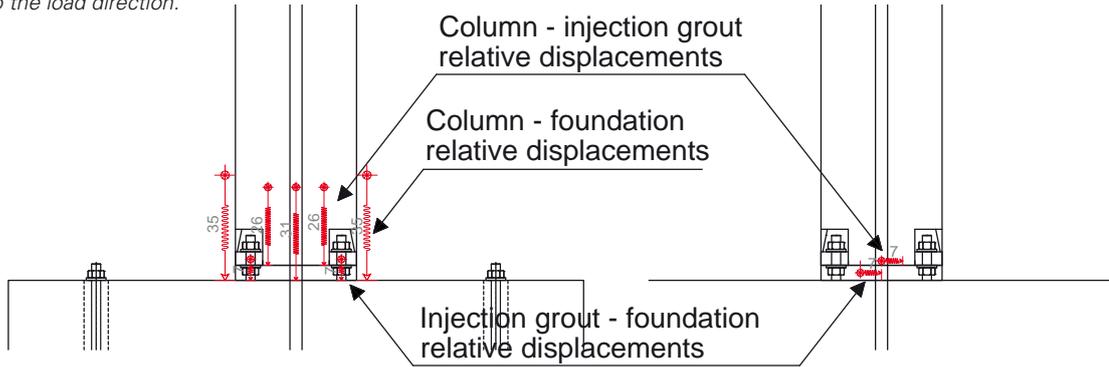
Instrumentation of the connection between column and foundation: (a) side perpendicular to the load direction; (b) side parallel to the load direction.
